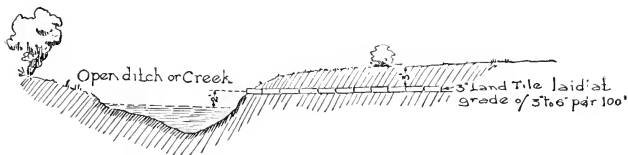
A good outlet should be provided for every main drainage line. The tile should follow the low ground, about three feet below the surface, and the end should open into a ditch or sewer two feet above the mean water level to prevent backing up and flooding
